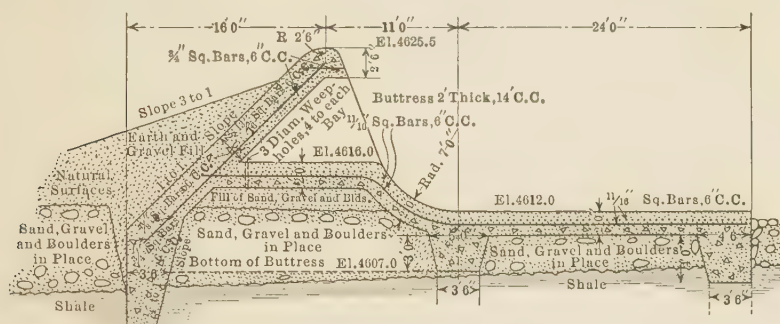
Section of Corbett diversion dam on Shoshone. Shoshone Project, Wyo.
